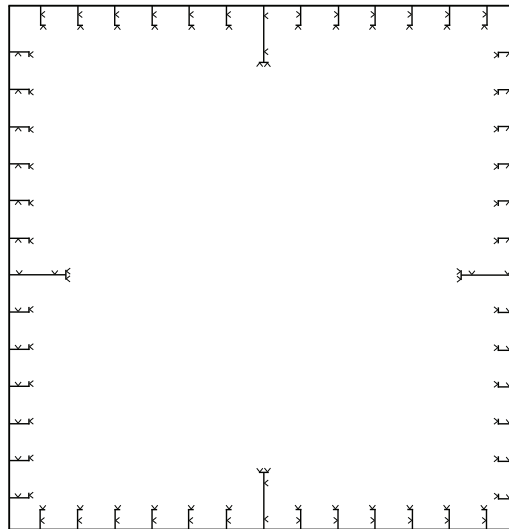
Typical location of measurement for pontoon reinforced transverse section of column-stabilized unit and TLP
